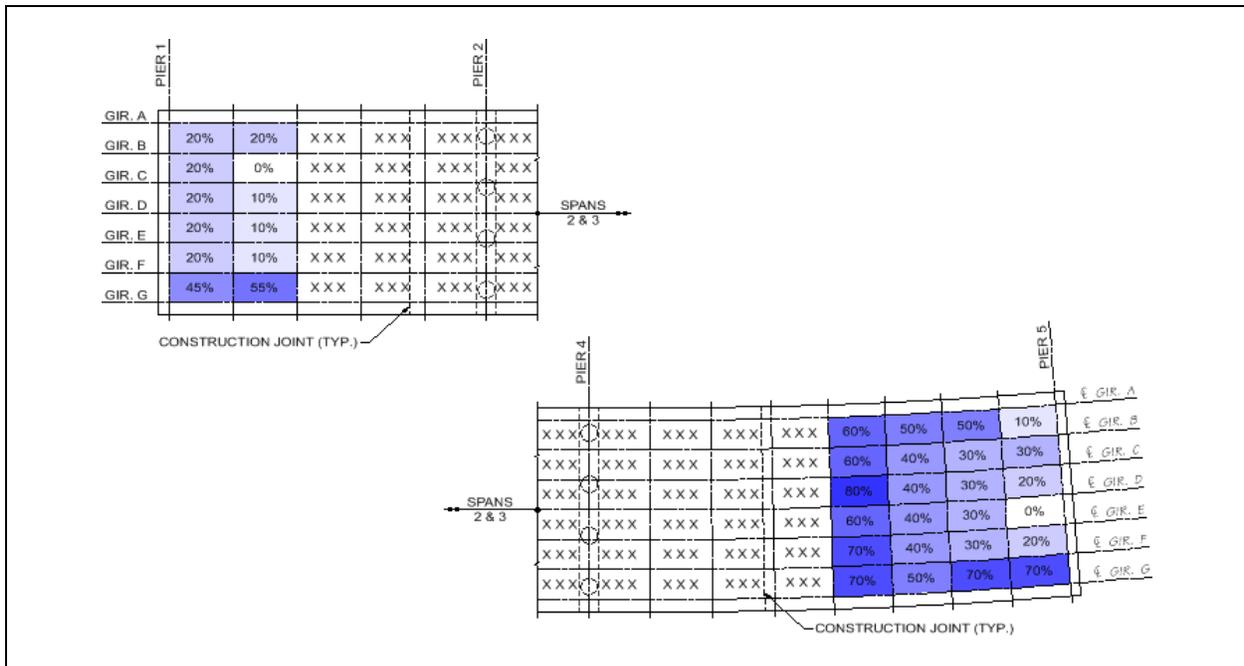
Bridge 529/25 Crack Intensity Diagram
